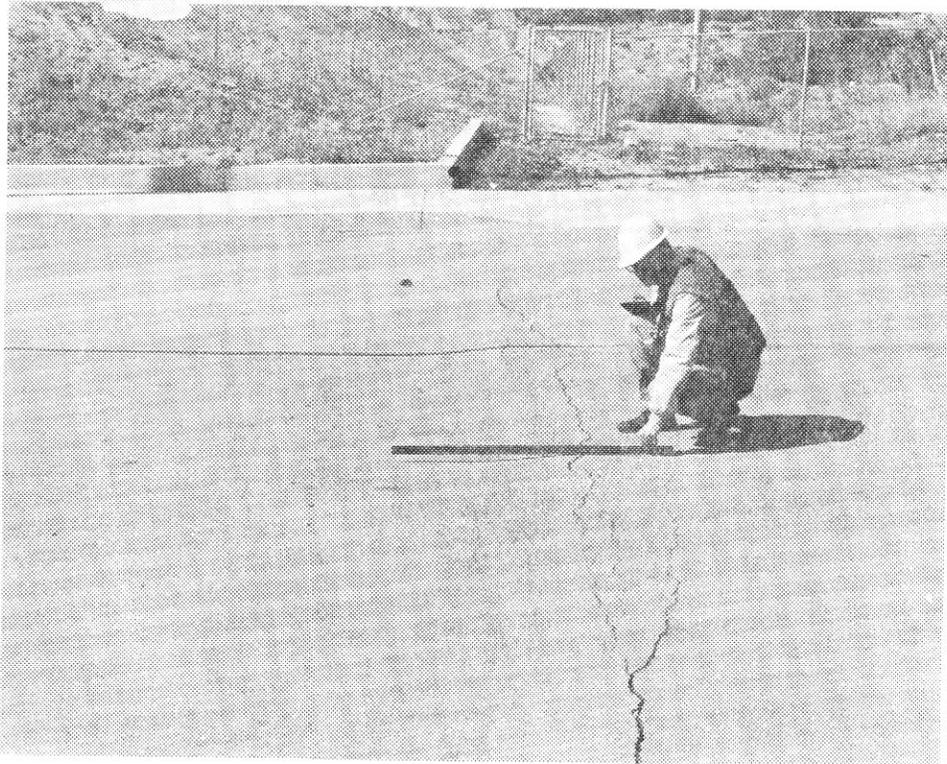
Looking west across Glenoaks Boulevard at tension cracks in AC pavement caused by differential settlement.
